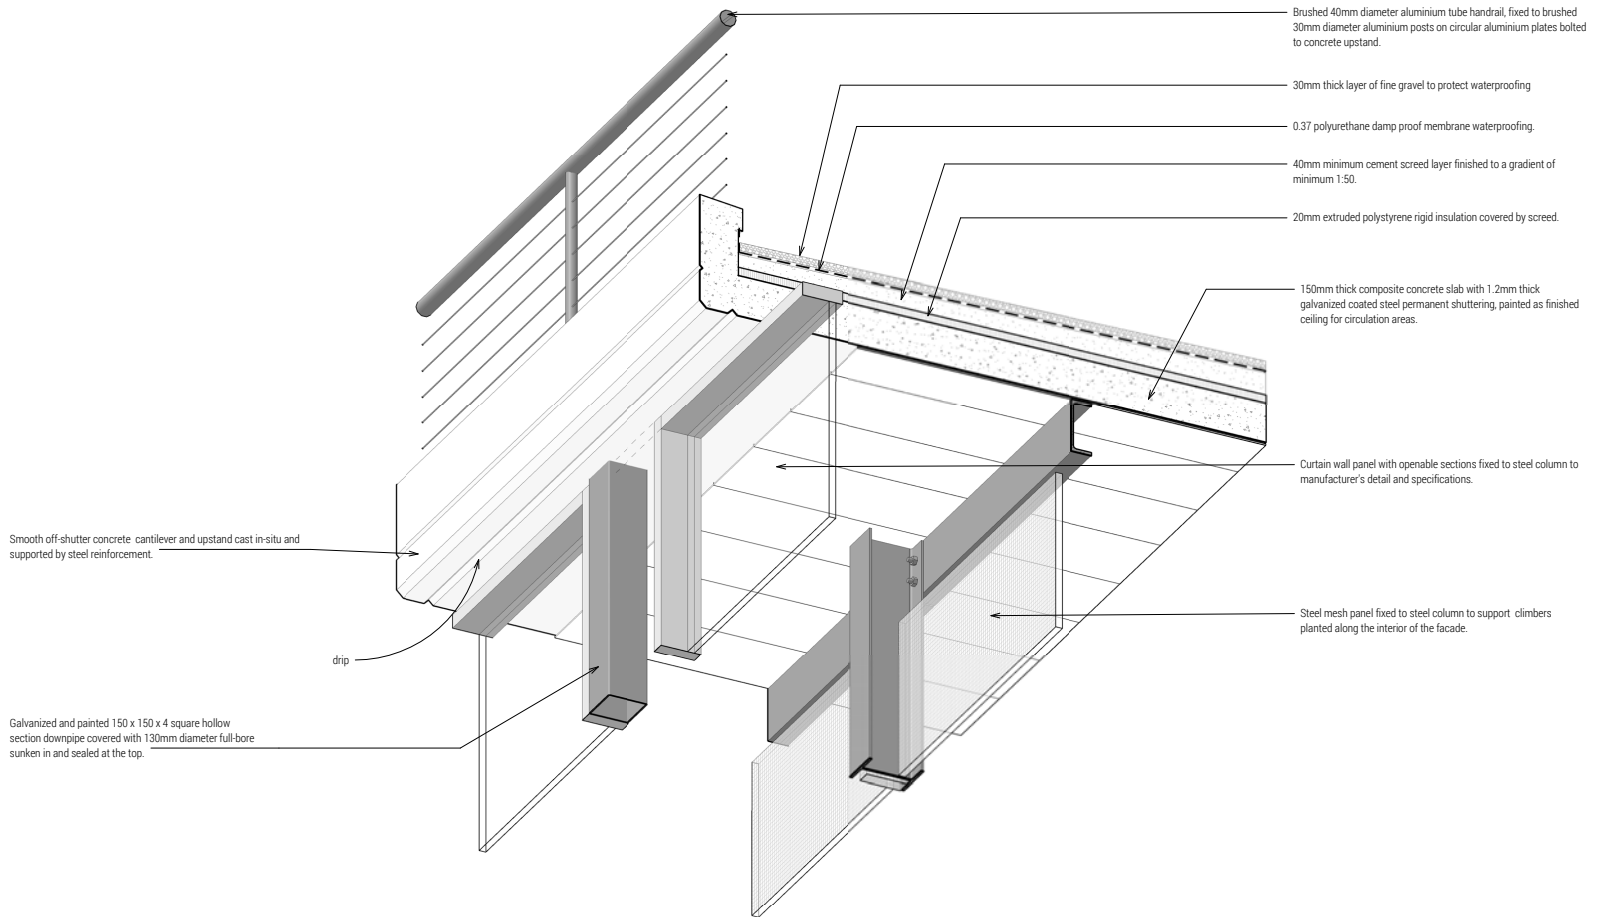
Three-dimensional detail drawing of roof-edge with rainwater downpipe and glazed facade (Author, 2017).
